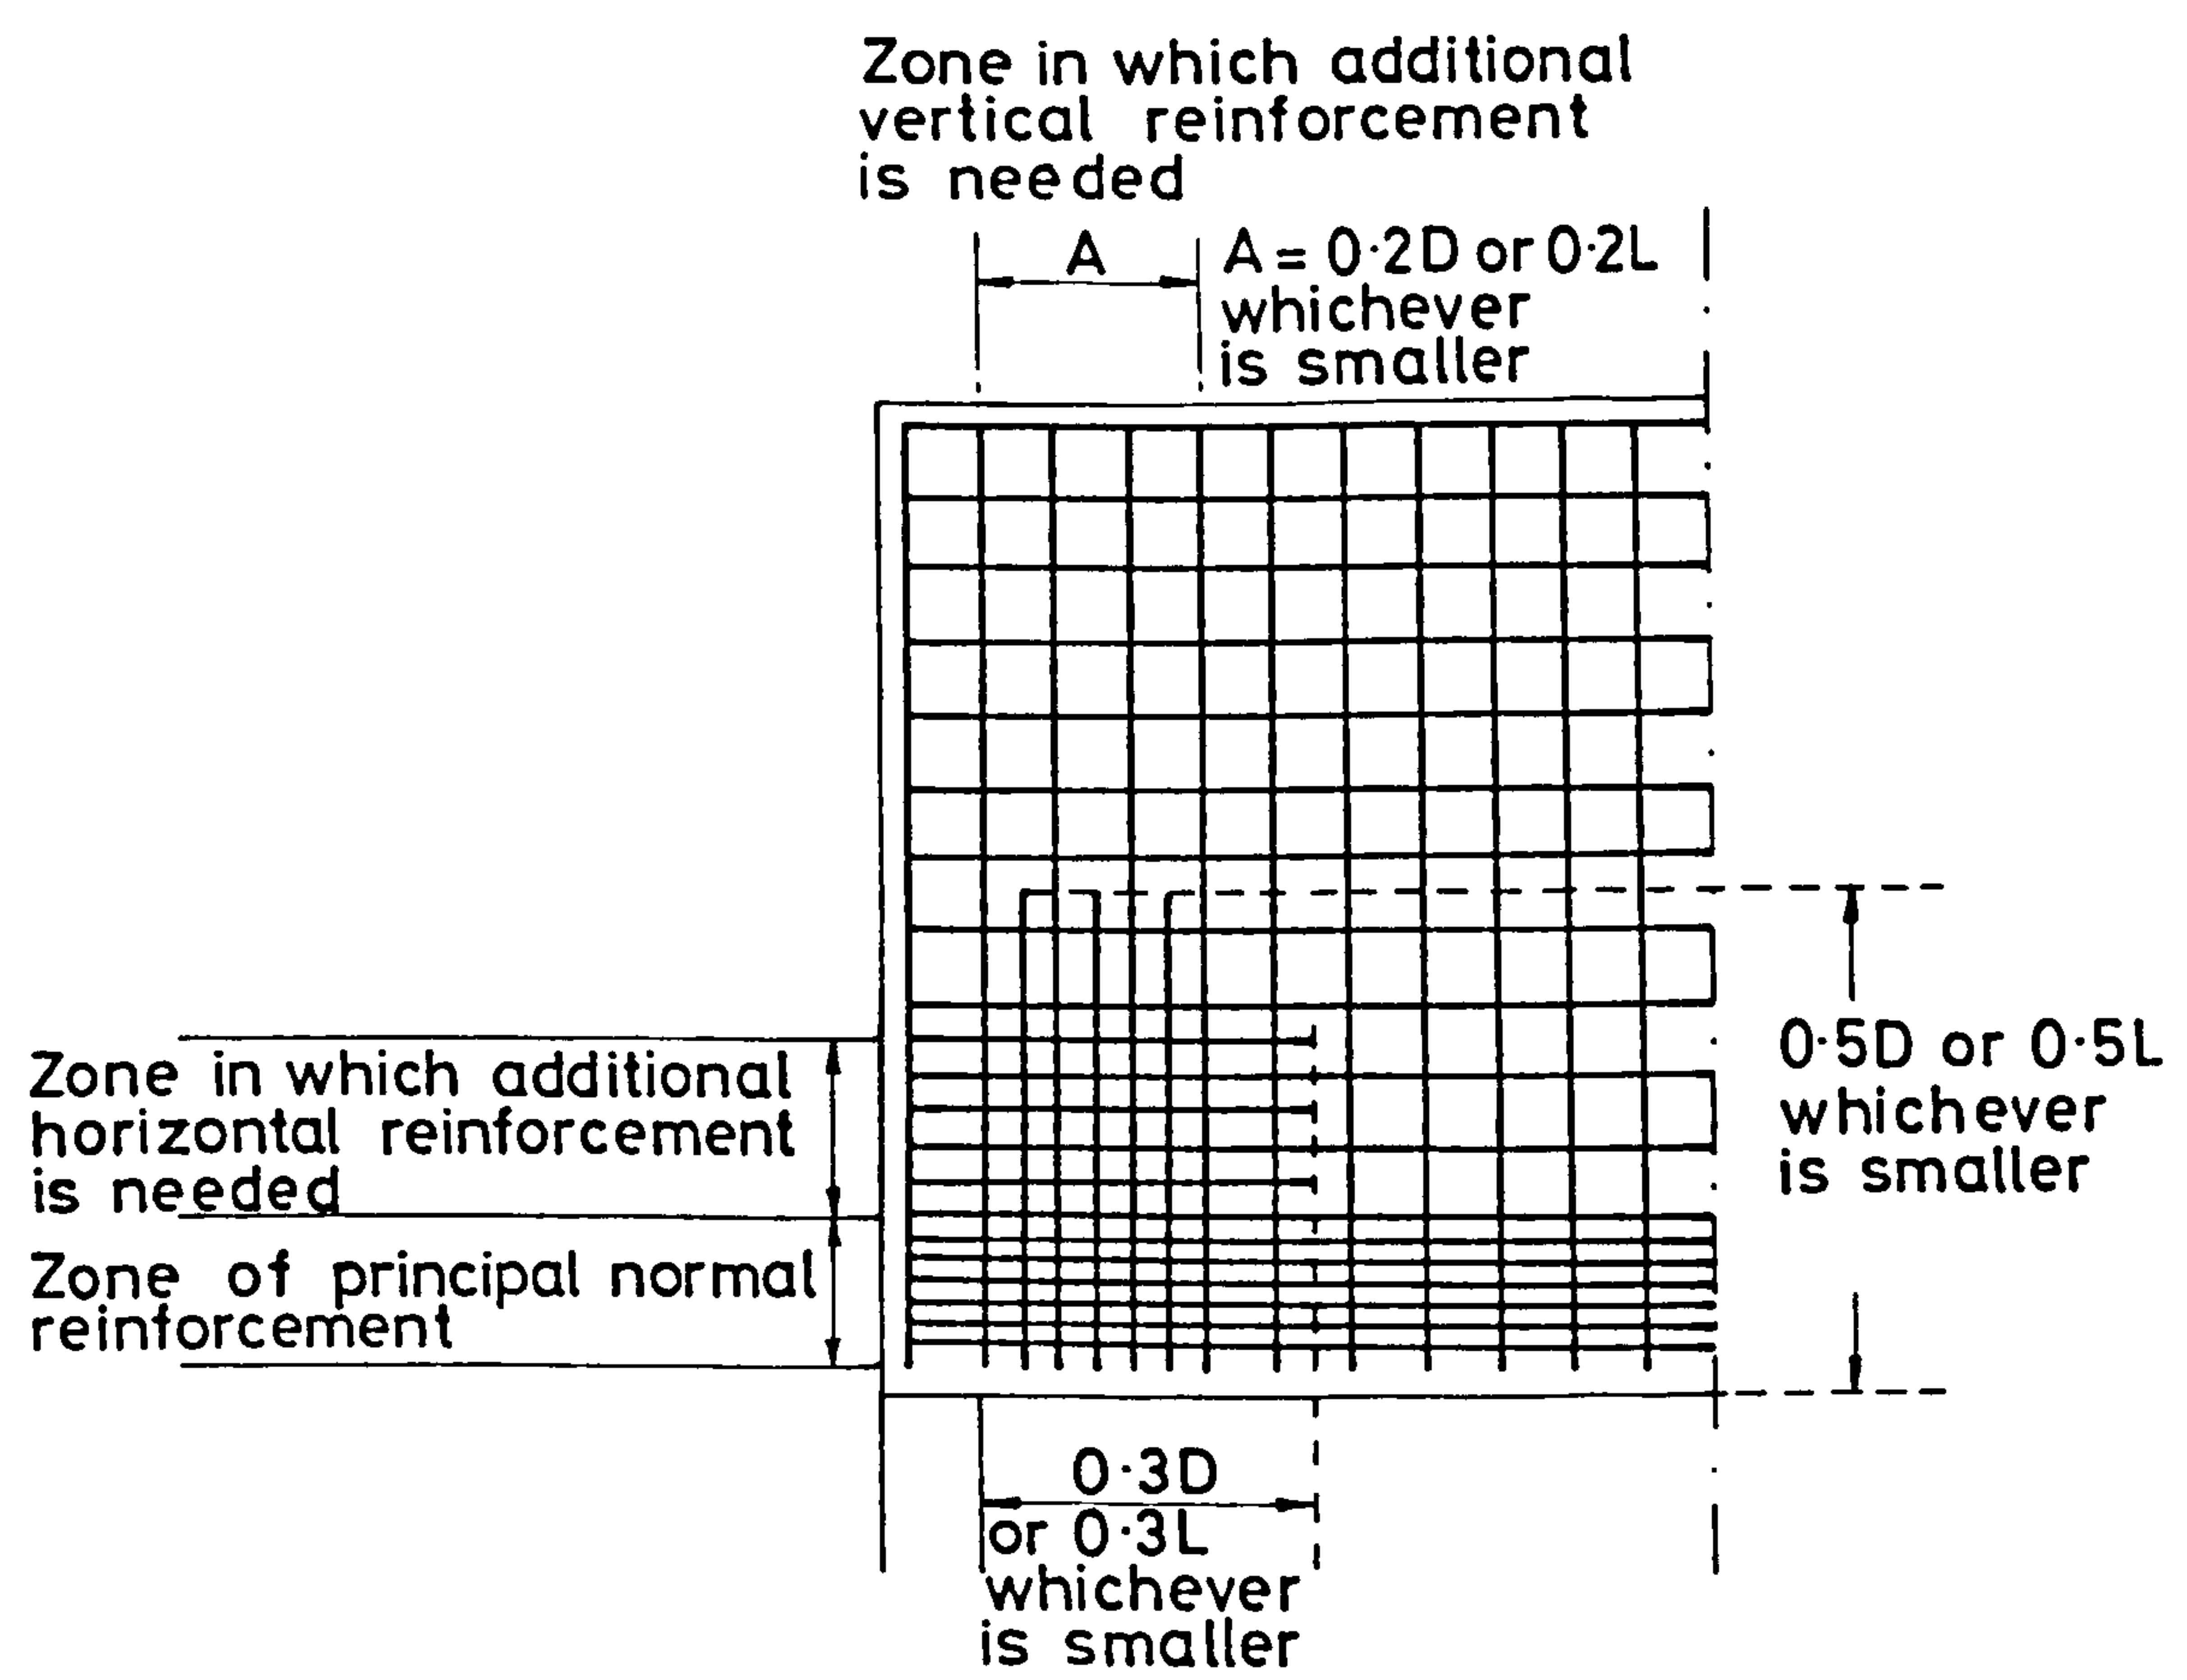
NOTTINGHAM TESTS: DETAILS OF WEB REINFORCEMENT
